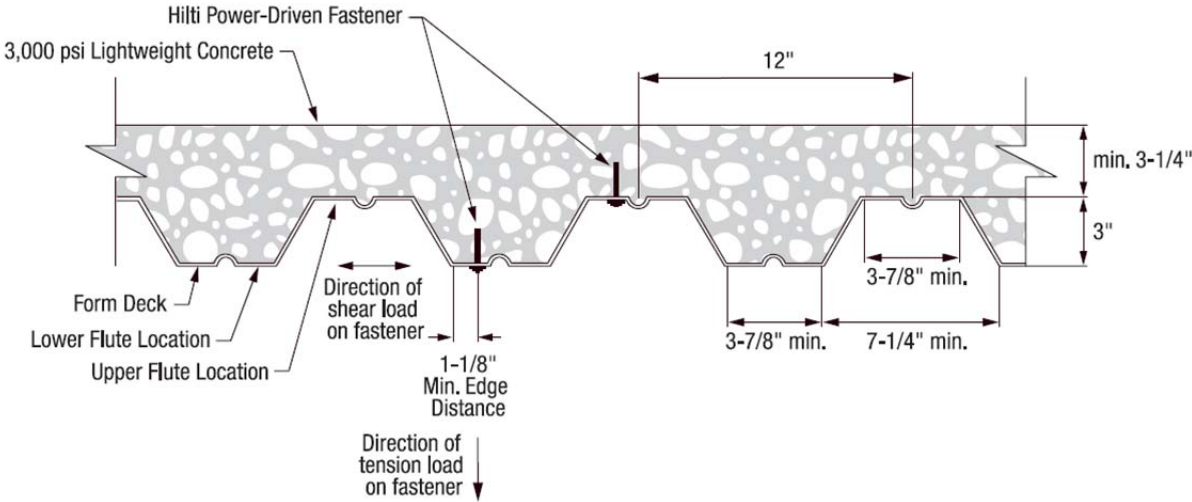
HILTI FASTENER LOCATIONS IN 3-INCH-DEEP COMPOSITE FLOOR DECK PANEL
